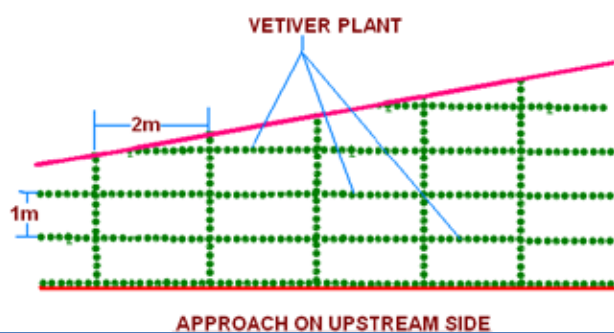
Slope Protection @ Bridge approach (Upstream side)
